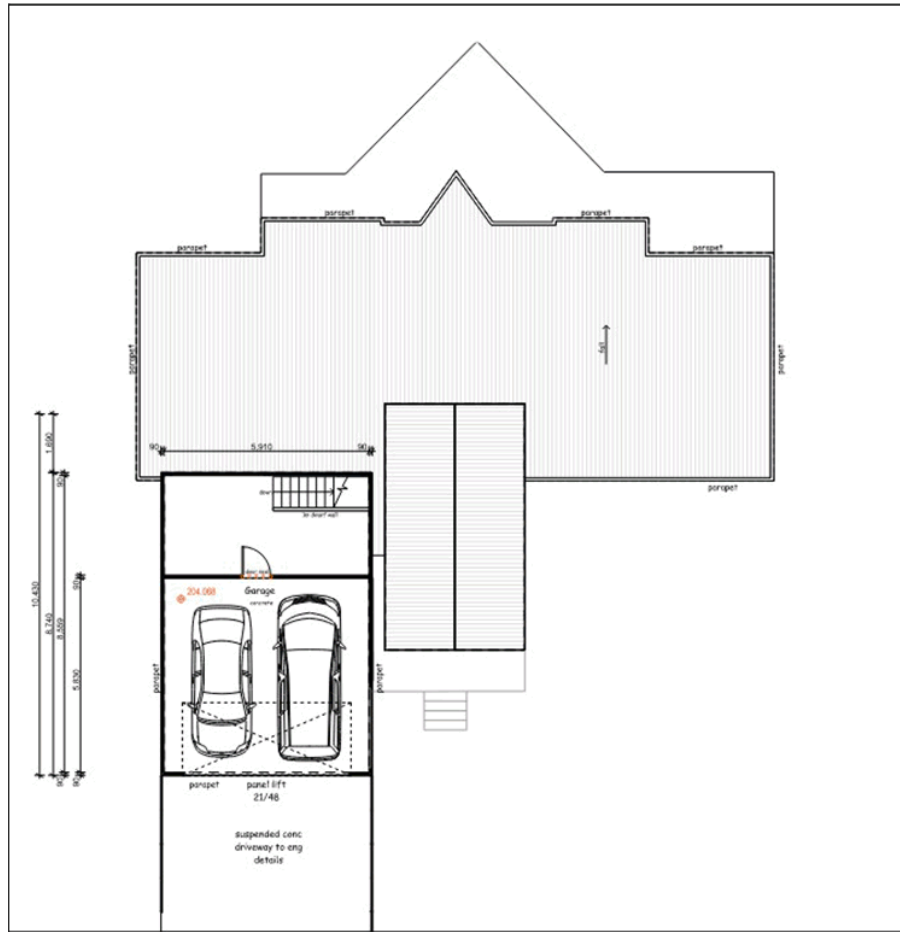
Proposed Upper Floor plan (DuoDesigns, 2020)
